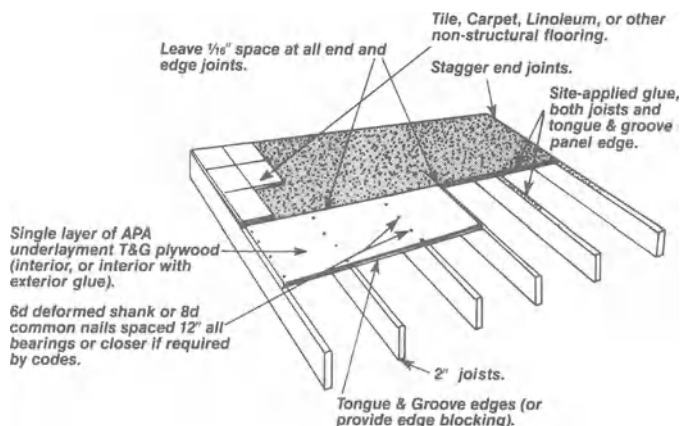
APA glued floor system (Courtesy of American Plywood Association).
